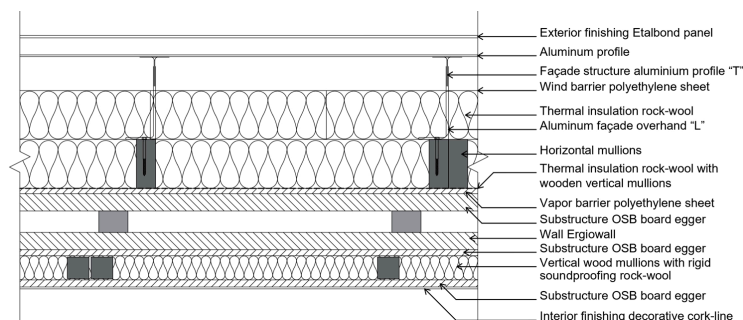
EFDEN house—horizontal section of the exterior wall. (By authors based on the EFDEN team drawings).
